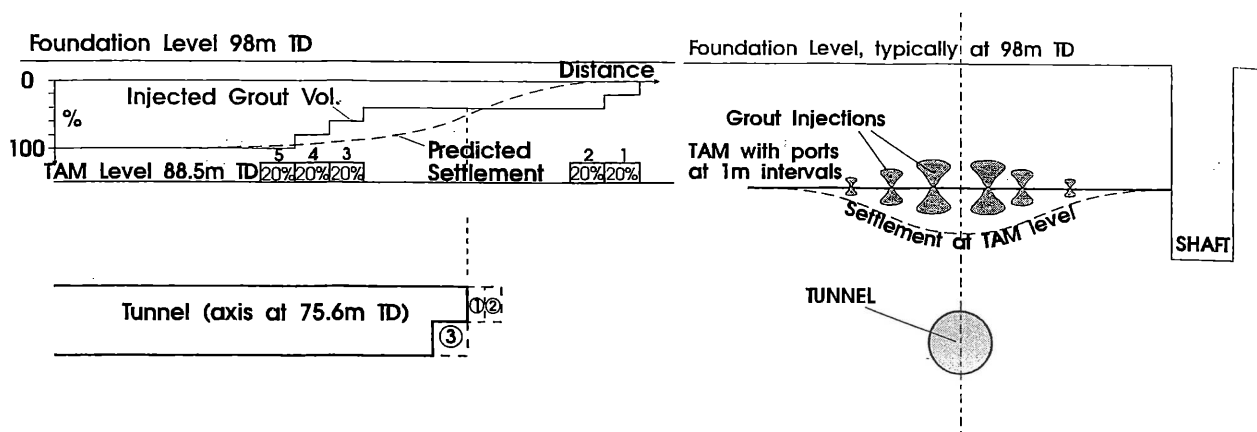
(a) Longsection showing location of grout blocks (b) cross section of grout block
